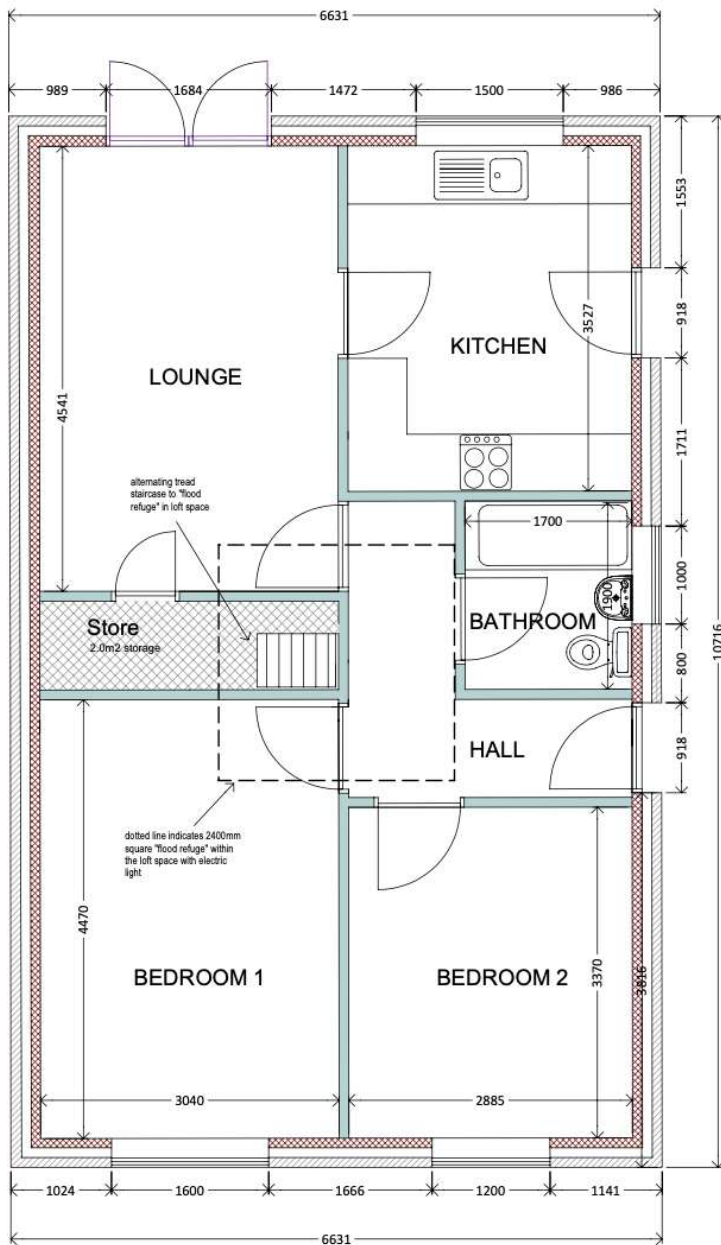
PROPOSED GROUND FLOOR PLAN
